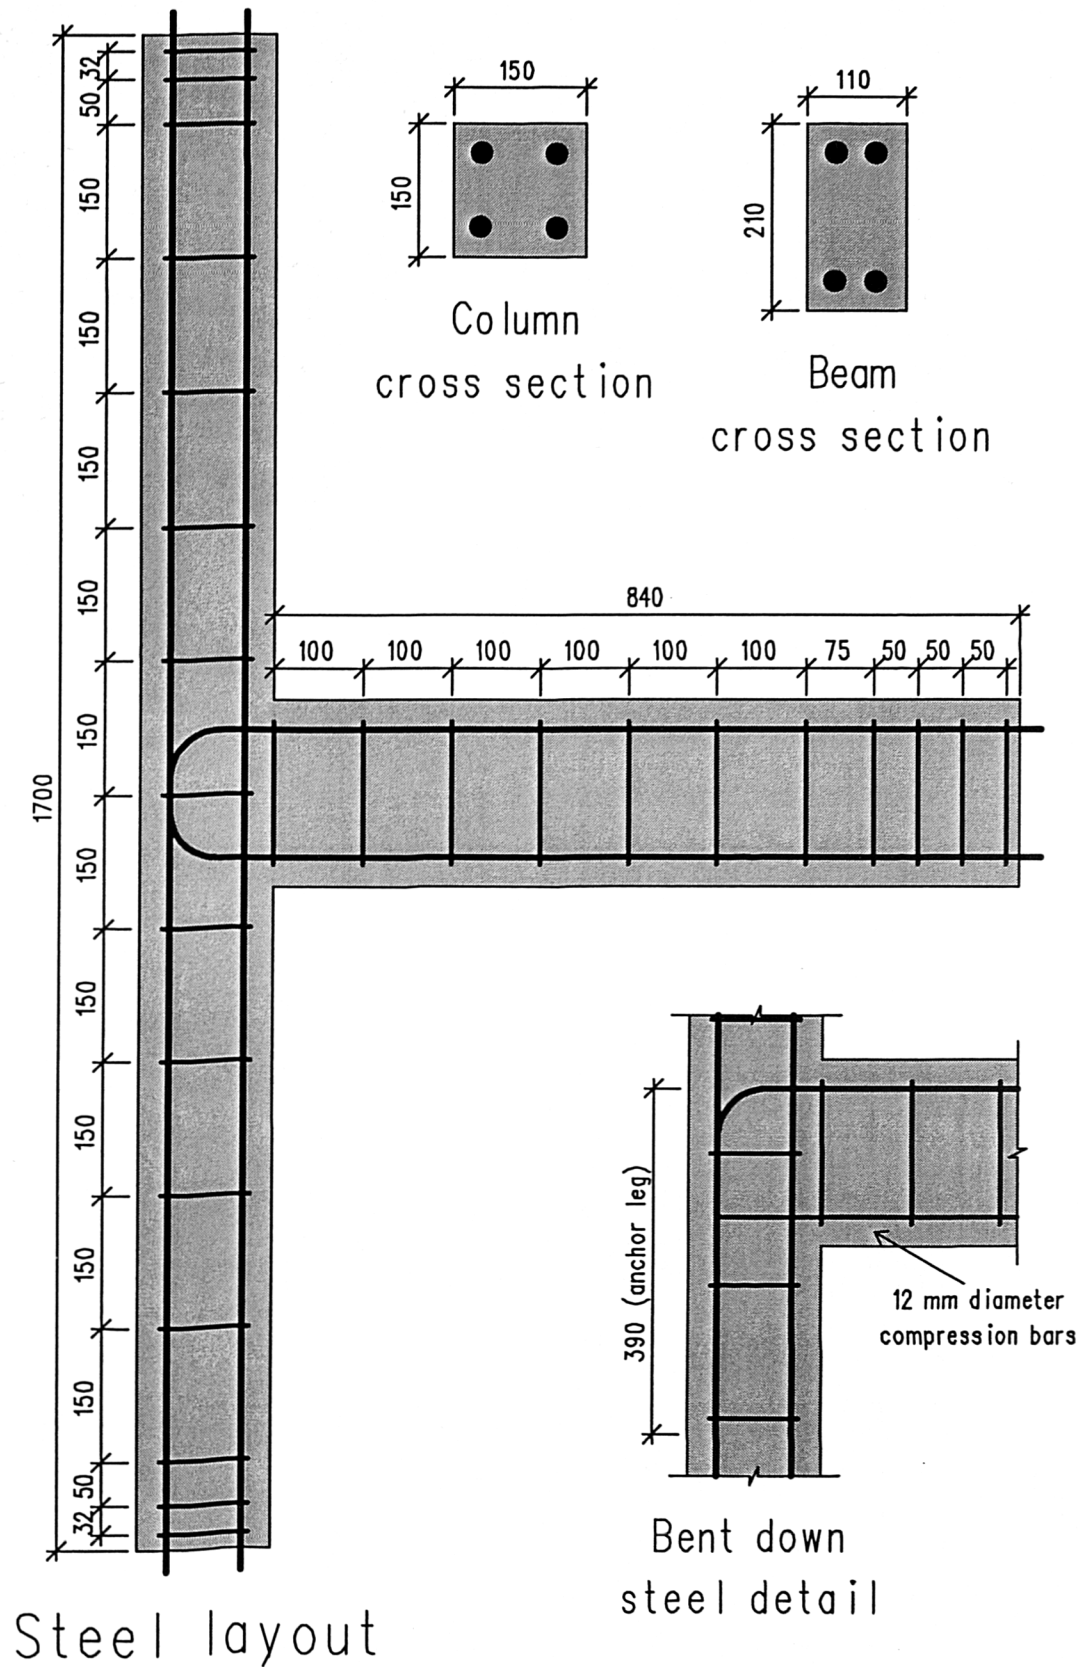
Specimen details - 210 mm deep beam
